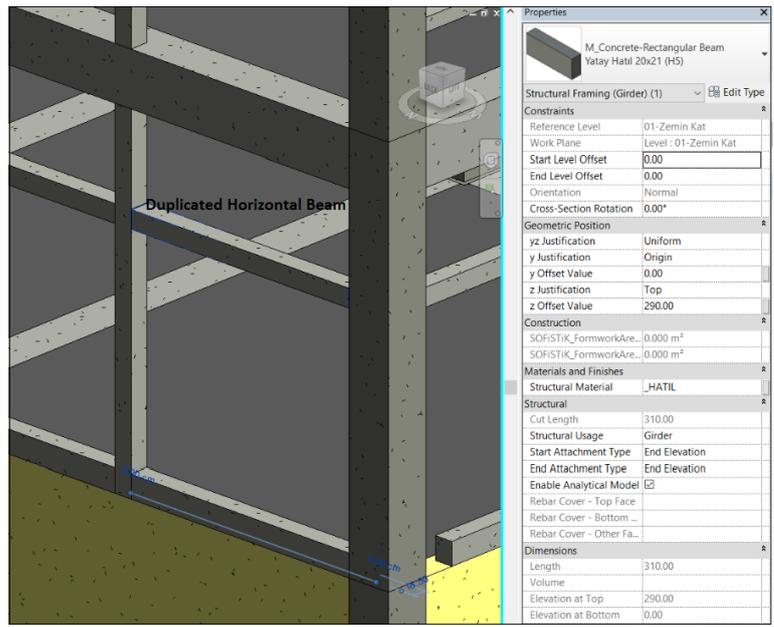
Duplicated Horizontal Beam in Revit Model
